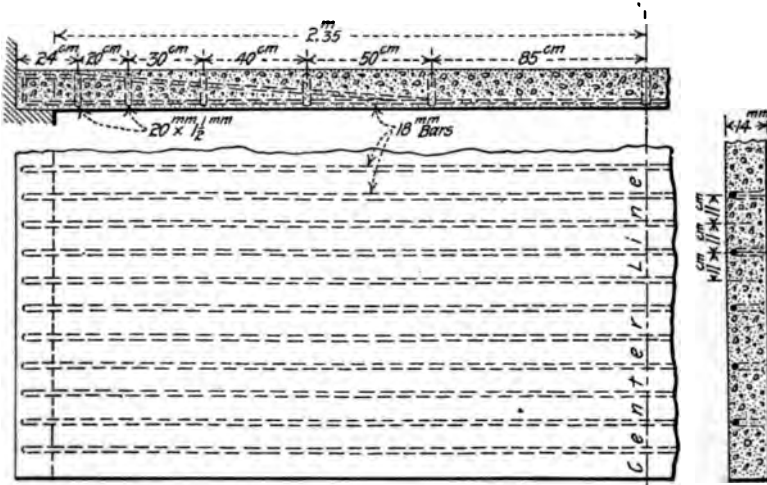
Hennebique Floor Slab with Single Reinforcement.
